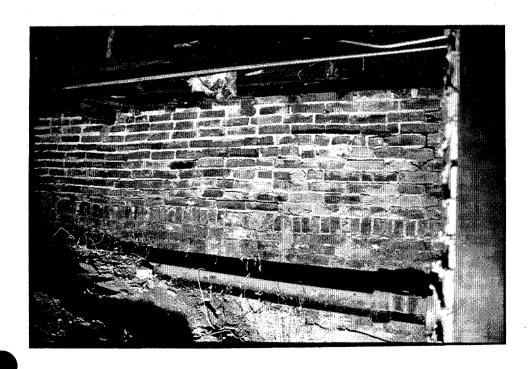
FOUN-DATION WALL AT THE 1874/1879 ADDI-TION
